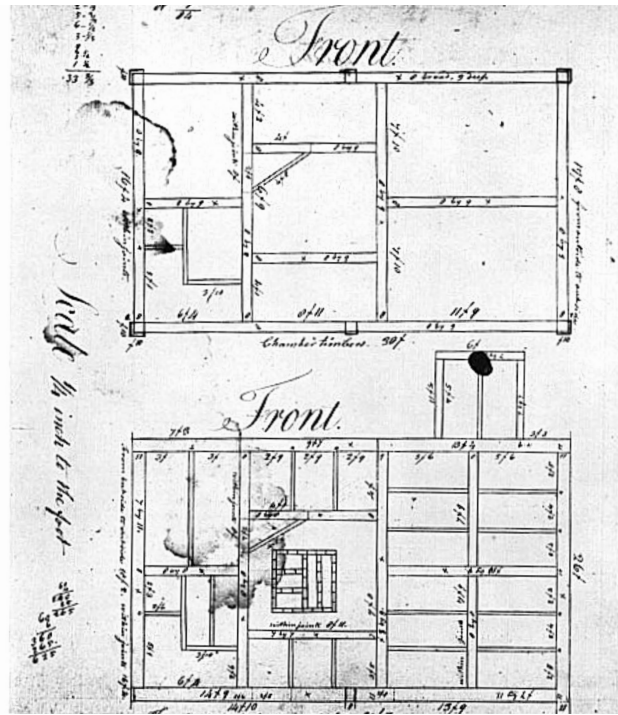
DRAWING BY JONATHAN FISHER FOR THE FRAMING OF FIRST AND SECOND FLOORS OF THE PLANNED ADDITION TO HIS HOUSE IN BLUE HILL, MAINE, 1814
